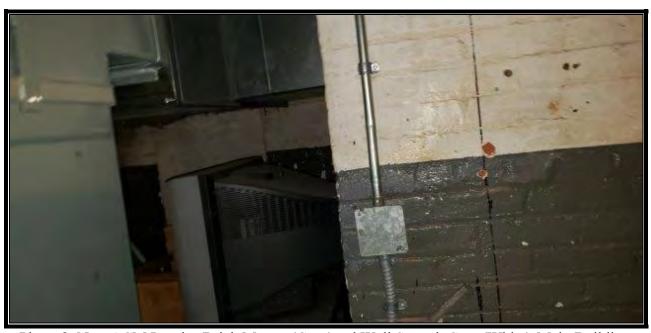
Non-ACM Interior Brick Mortar (Gray) and Wall Scratch Coat (White)-Main Building
